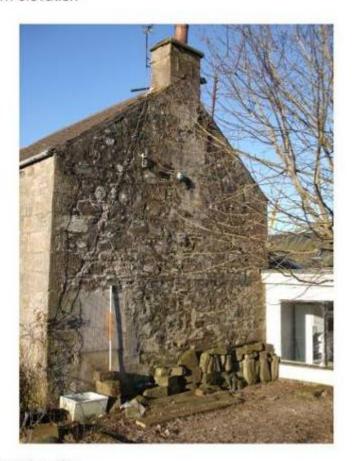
Building 1 reused worked stone in North Eastern corner of Eastern elevation
